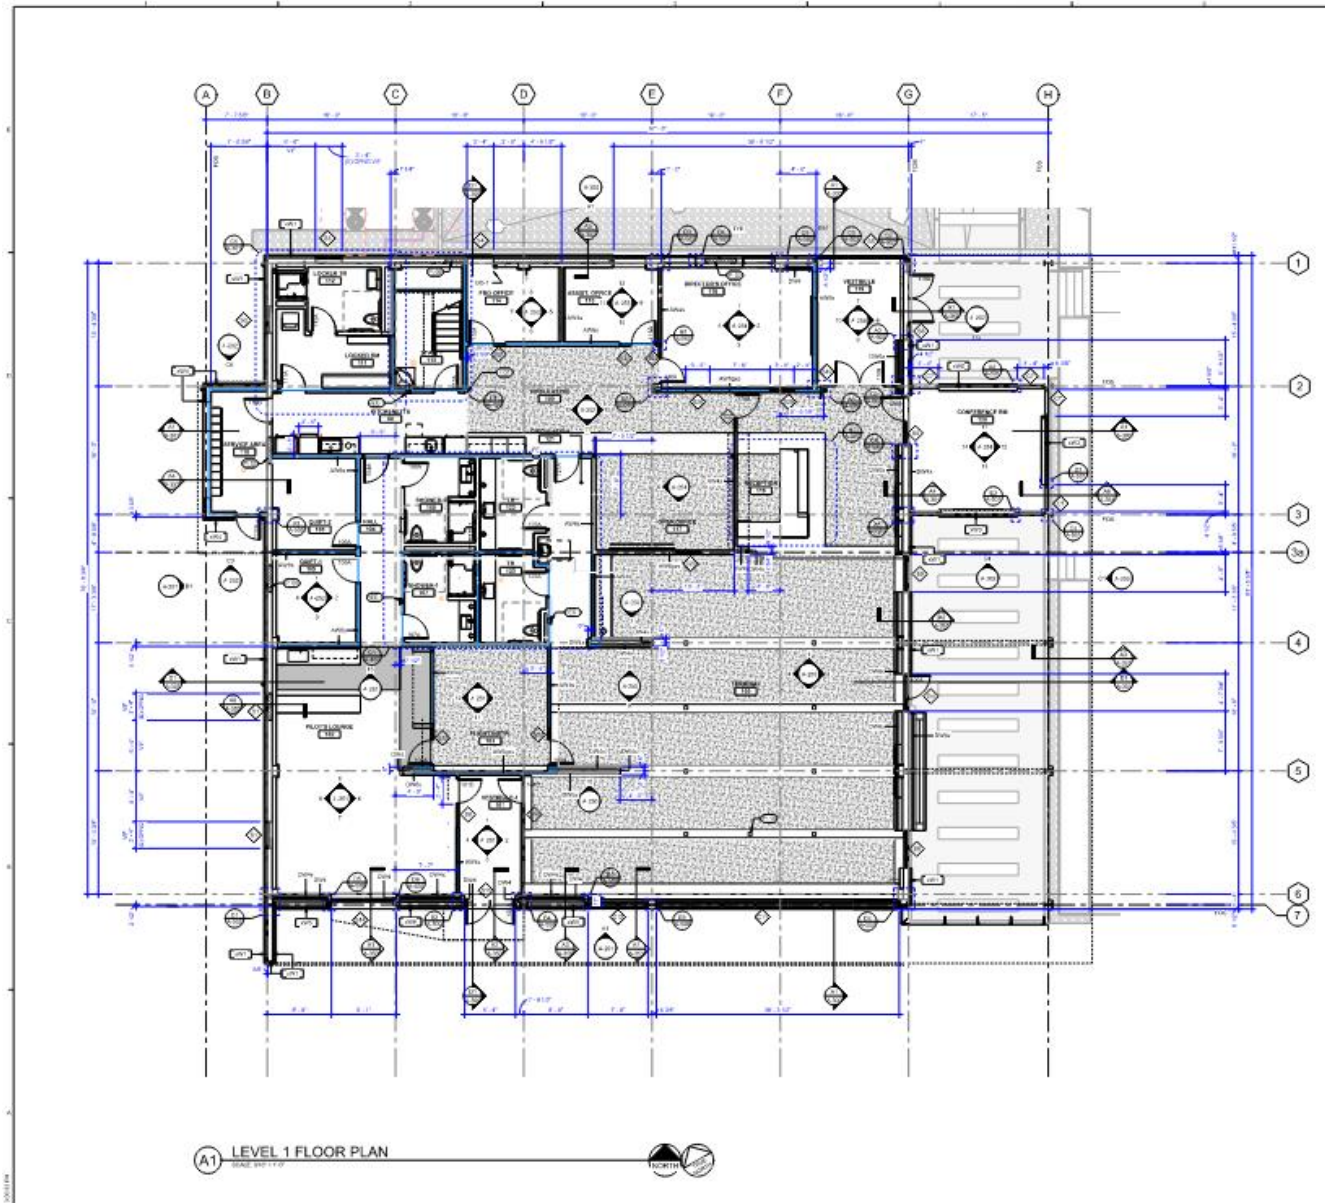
Conceptual design of the floor plan of the rehabilitated structure (Proposed Action).
